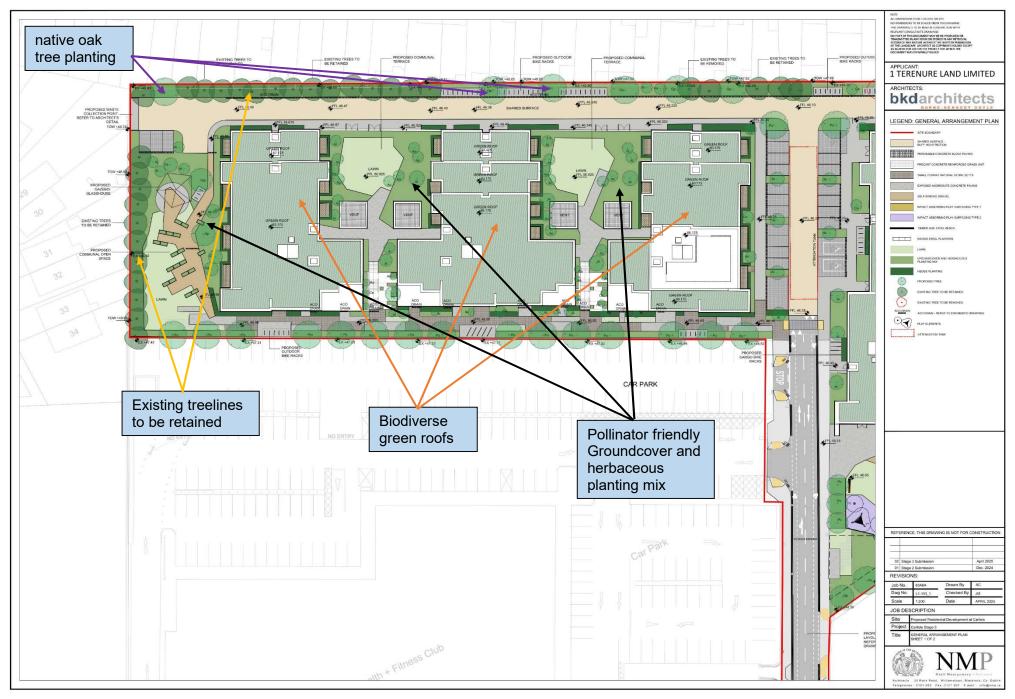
Proposed landscape and Green Roof Plan – sheet 1
